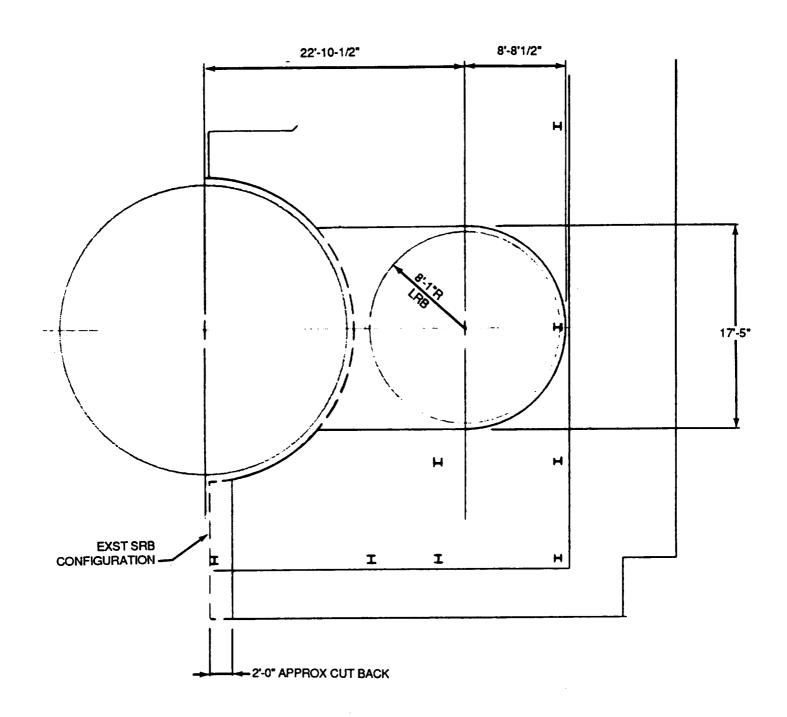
1.3-12. 1st Floor - Platform 'C'.
